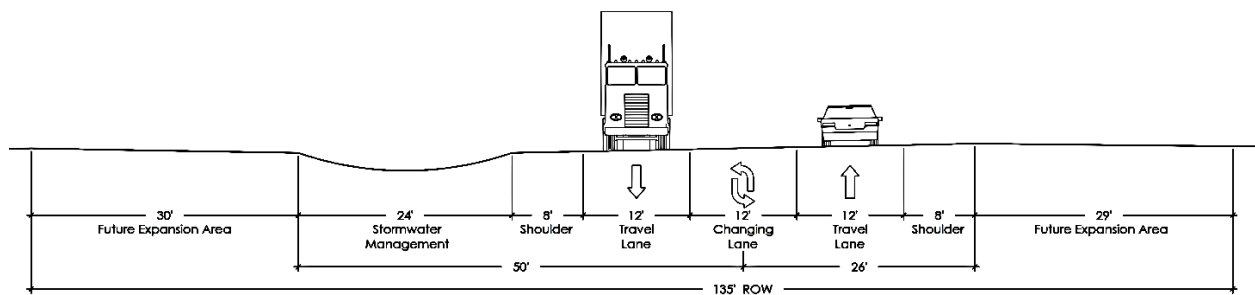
Fink Road (looking east) Near-Term Cross Section for Segment Adjacent to CLIBP
